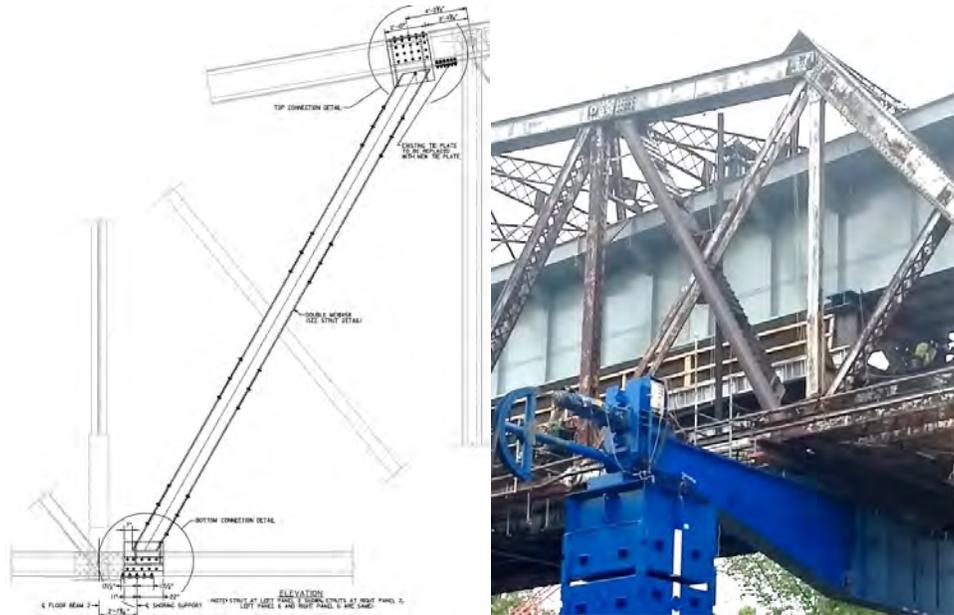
& 11: Final drawing of the strut & The strut as constructed on site
